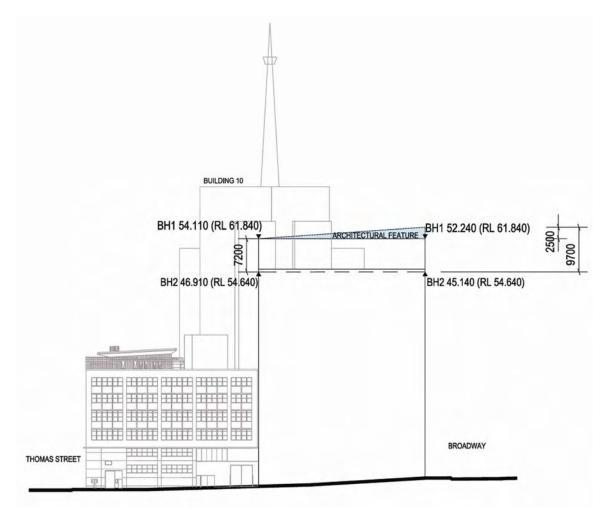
West (Wattle Street) elevation of architectural feature (Source: DCM)
